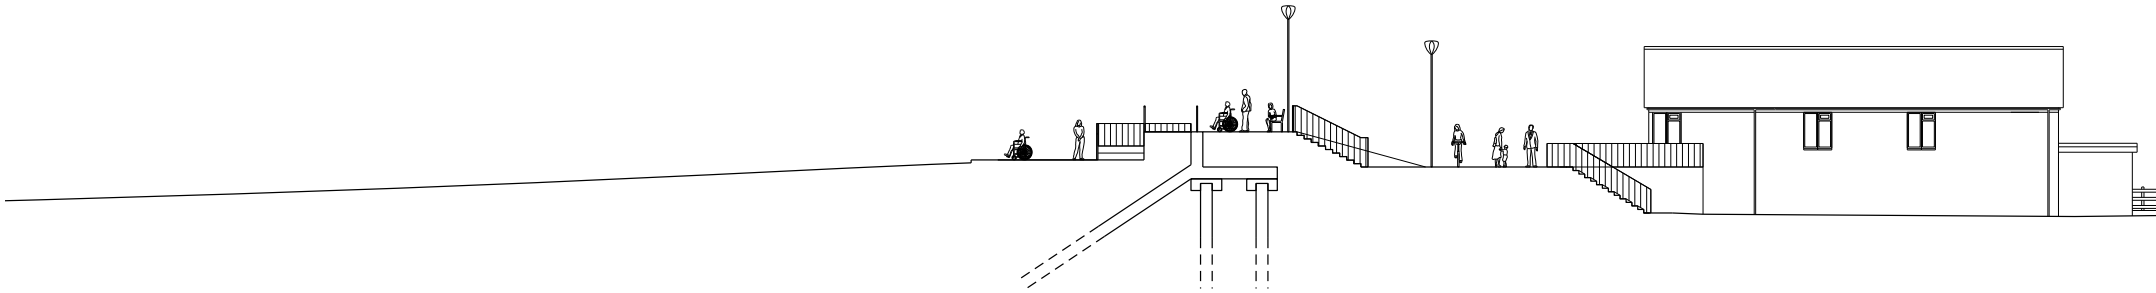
Option B - indicative section through beach and sea wall at the Village
